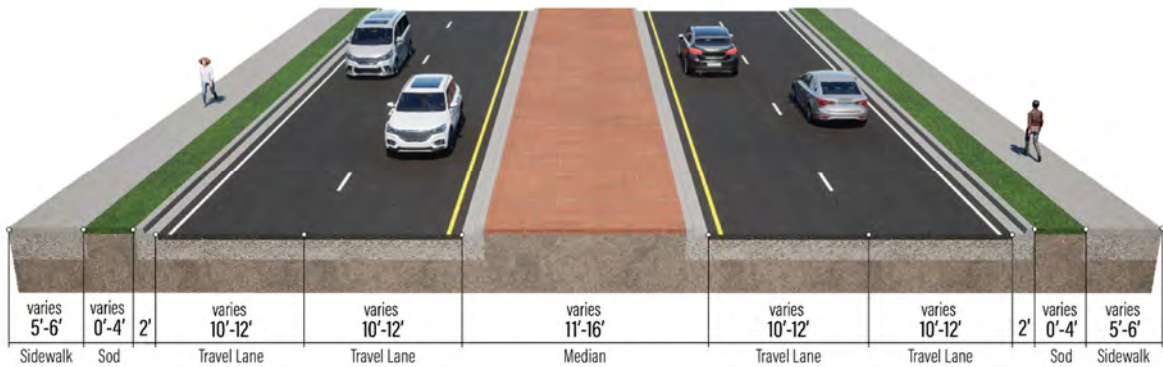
Existing Typical Section 10 - 8th Avenue in Bradenton from US 41 Business to 9th Street
